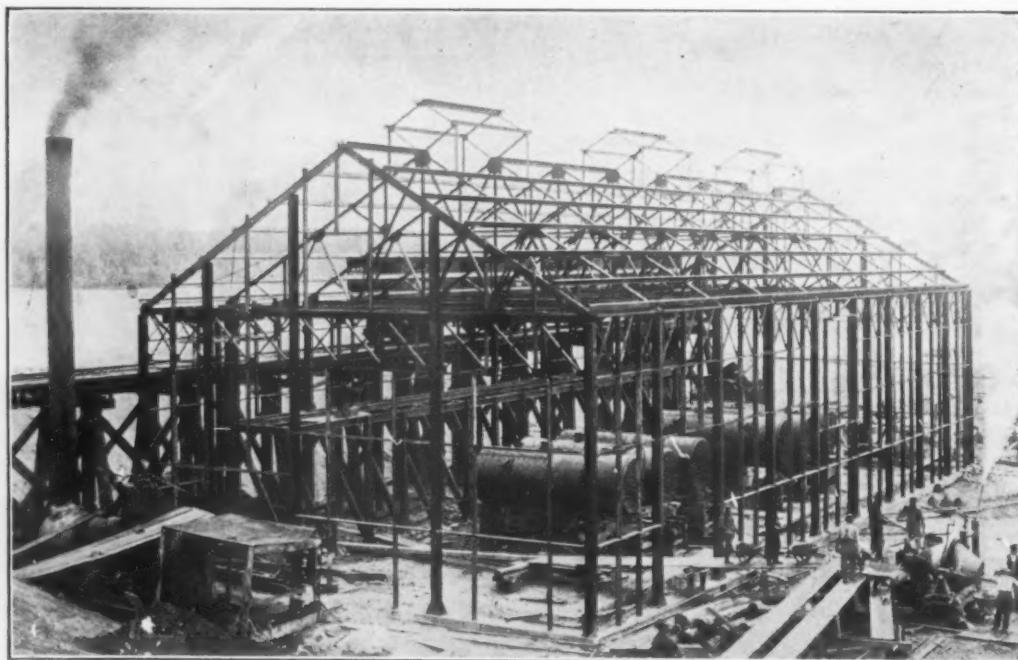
Steel Frame of Boiler House for New Concentrating Plant.
